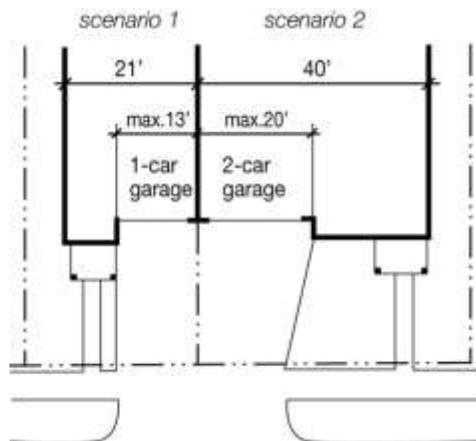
Townhouse, Parking and Access, Parcels Without Alley Access
